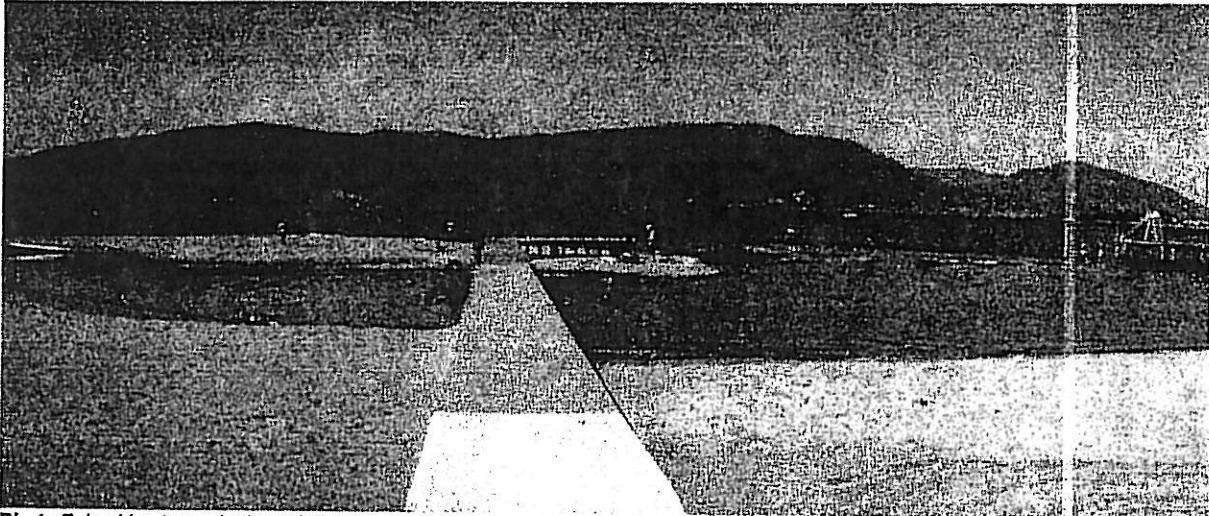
Looking towards the existing moorage and accretion of sand that has occurred beyond the moorage, adjacent the subject property.
